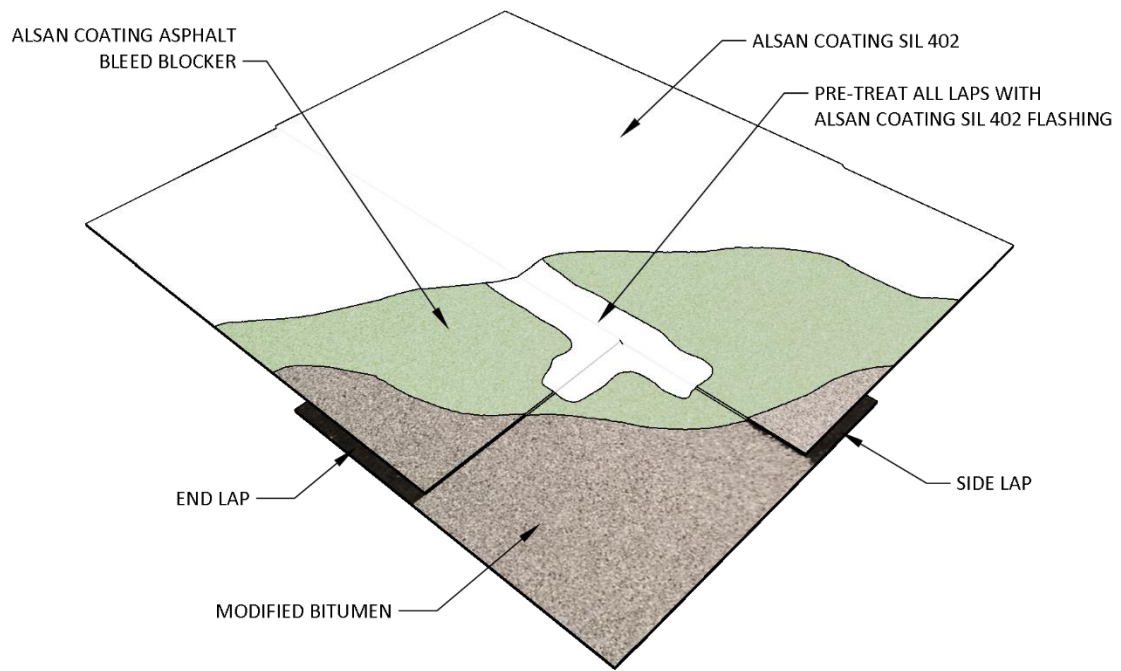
Silicone Roof Coating Over Modified Bitumen, Side/End Laps
